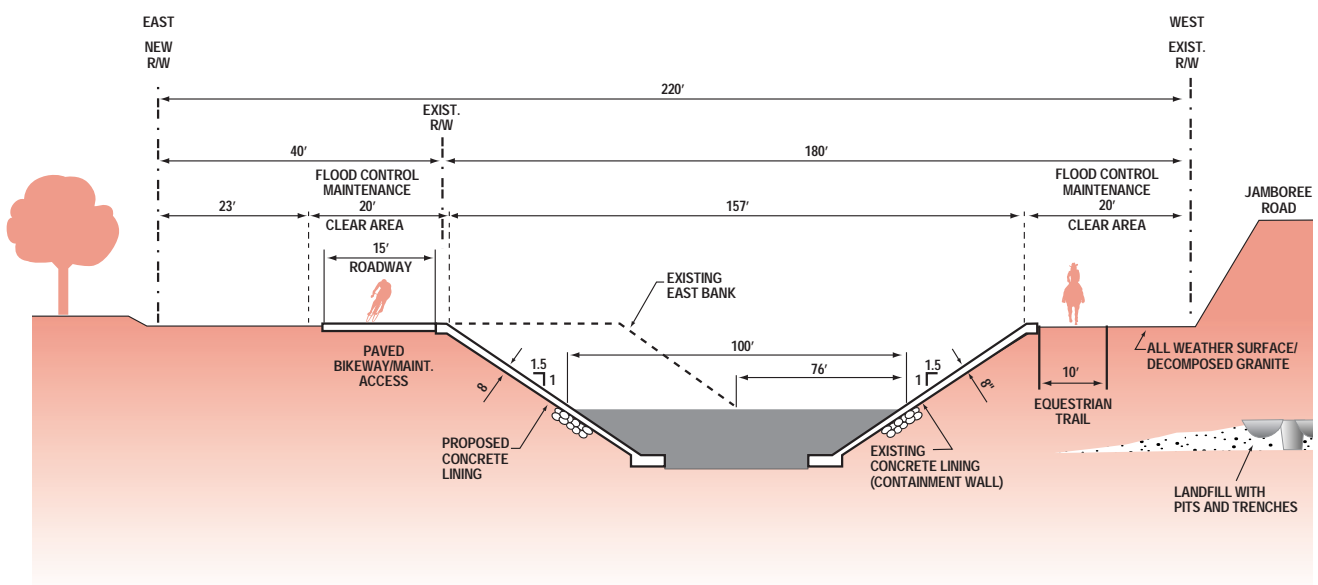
Peters Canyon Channel East Side Widening Alternative (Looking Downstream)
